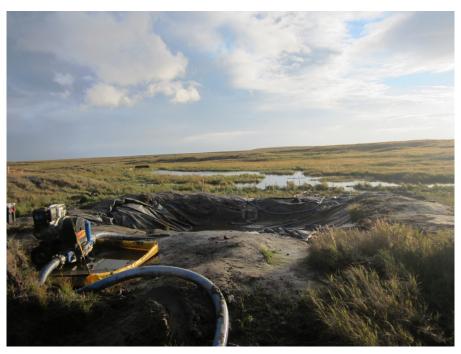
15 September 2013 Water pump at Site 28. View facing east.
